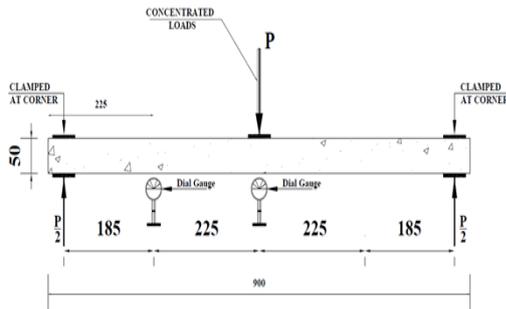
Typical schematic sketch of experimental arrangement and slab specimen setup
